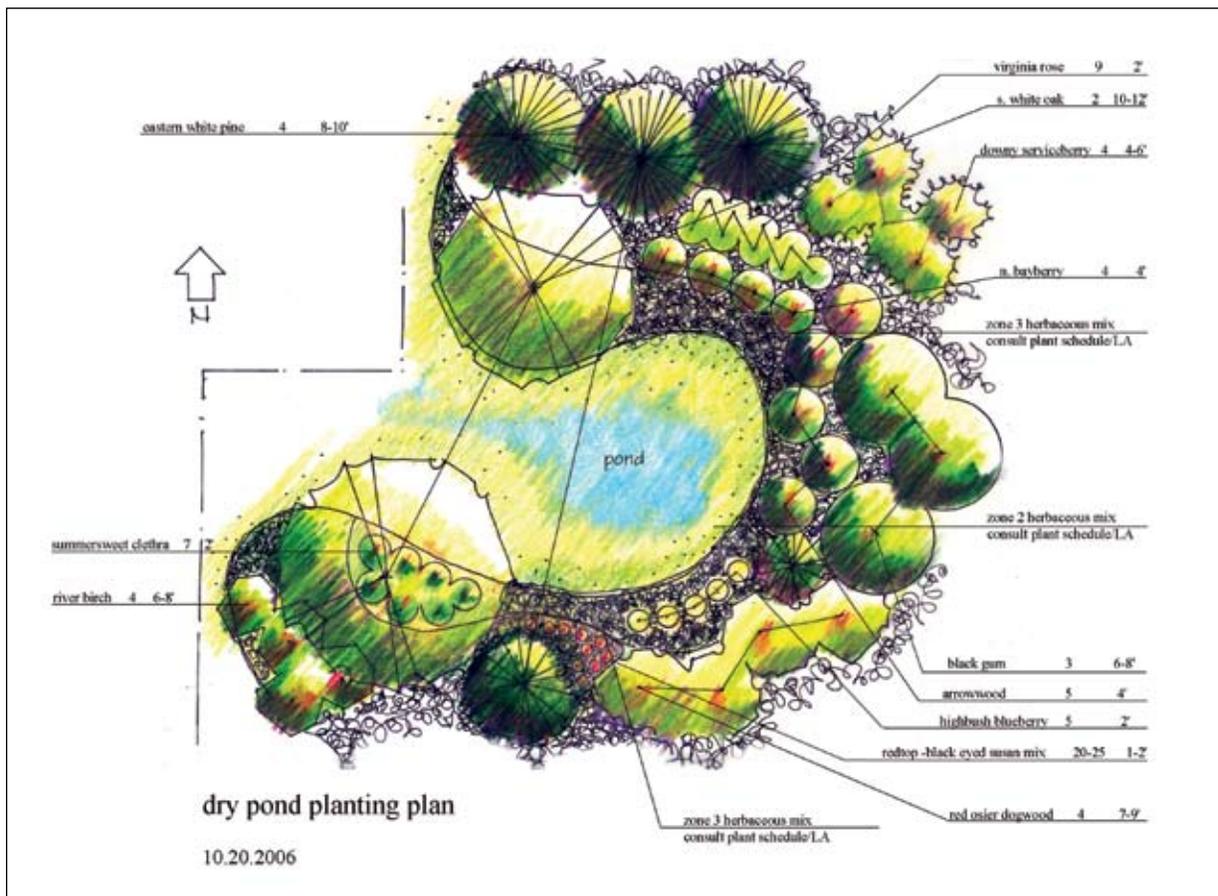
A planting plan for an urban reforestation site includes a map or sketch of the site showing the locations of species to be planted.
